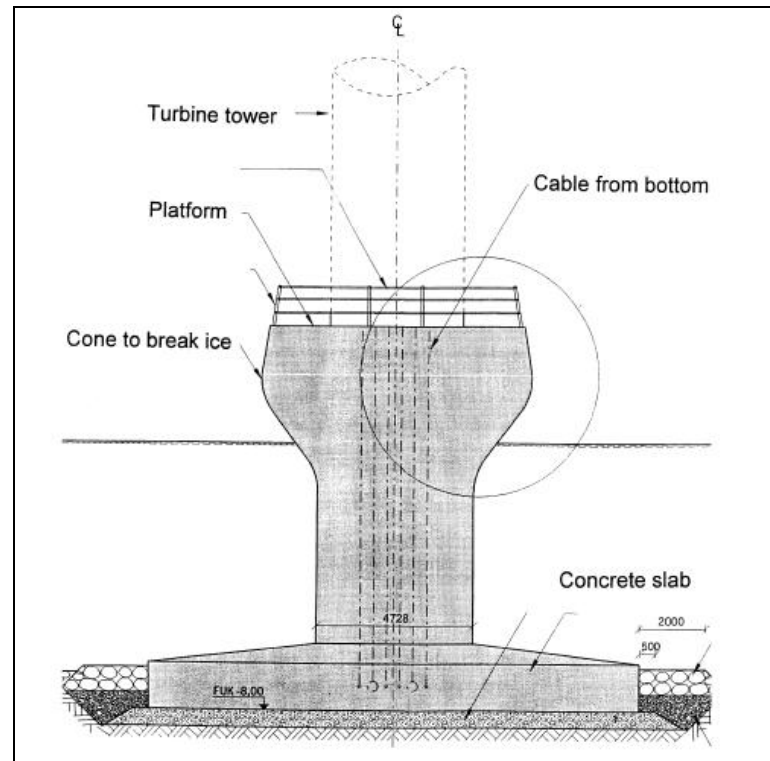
Design of the concrete gravity foundation (SØRENSEN et al., 2002).
